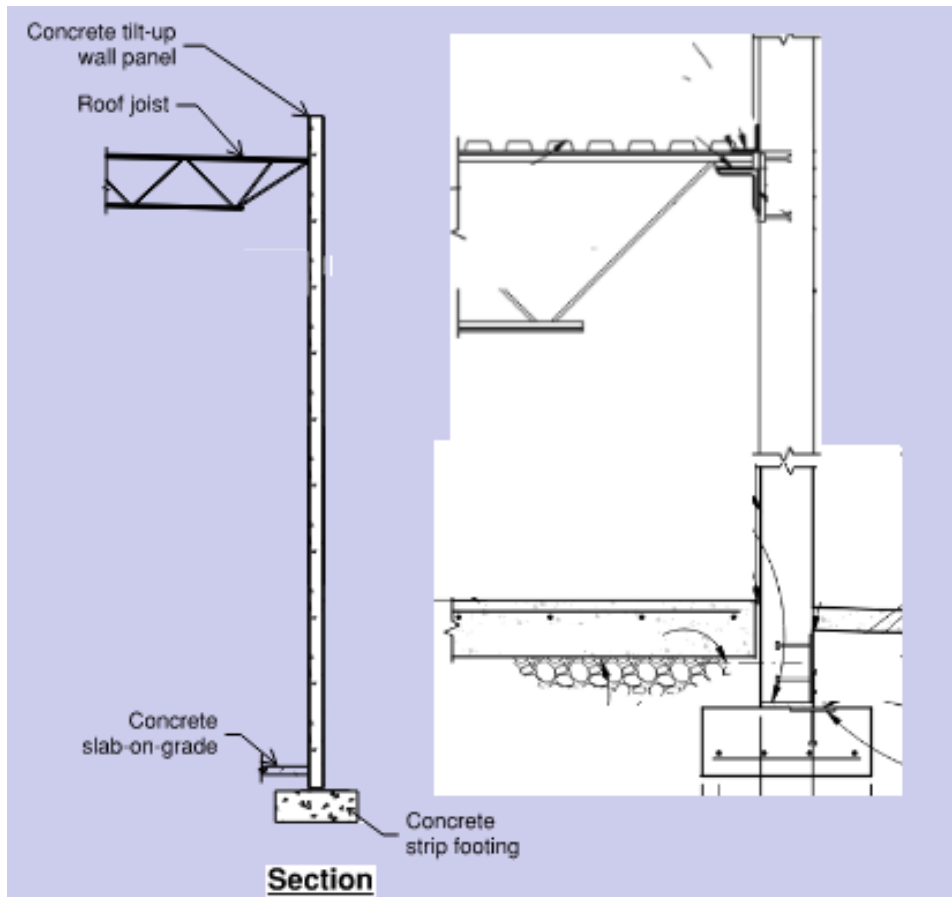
Building section at typical wall panel, with enlarged roof and foundation details
